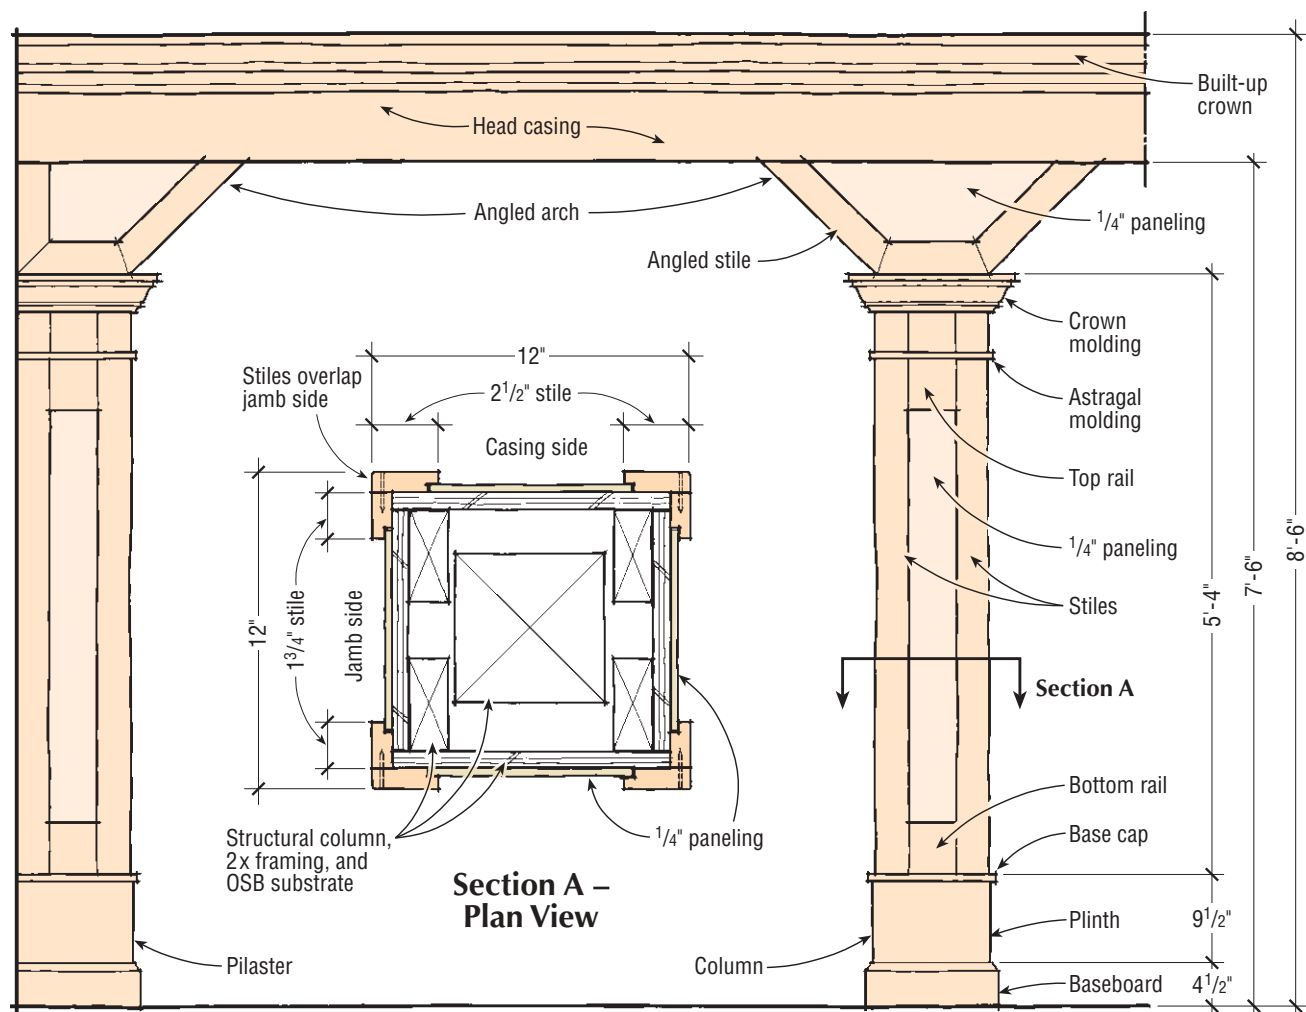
Rabbeted stiles and rails, joined with pocket screws, and 1/4-inch plywood panels create a production version of an expensive-looking paneling job.
